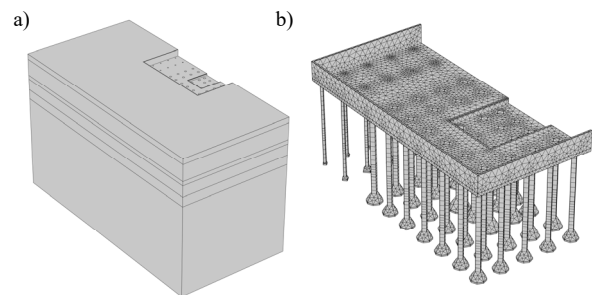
a) numerical model of the building foundation system and surrounding soil; b) finite element mesh of the foundation system.
